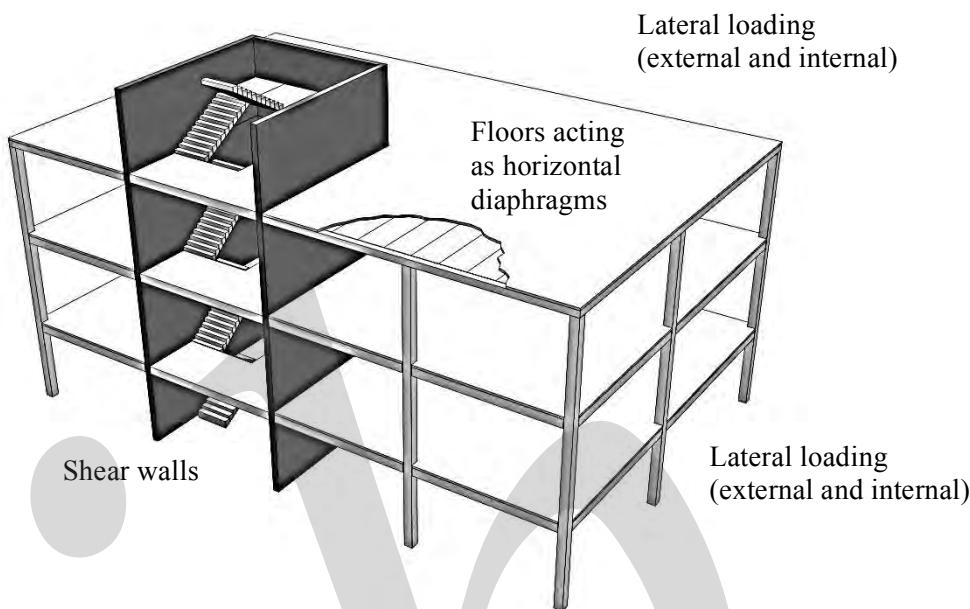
Floor diaphragm action in a pin-jointed, braced skeletal structure
